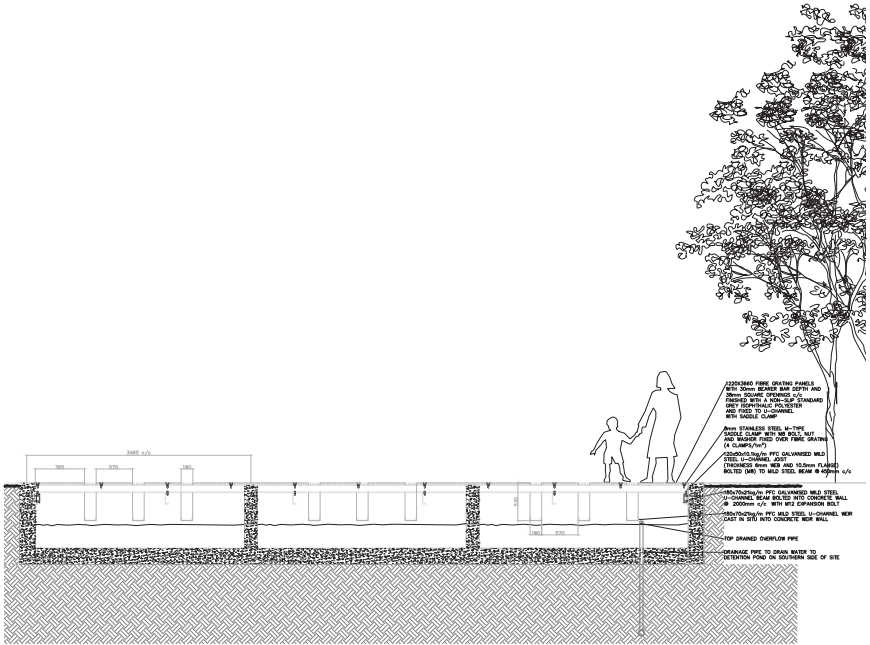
Detail 4.1-Section showing cattle water trough and fibre grating walkway over channel - not to scale (Author: 2013)
